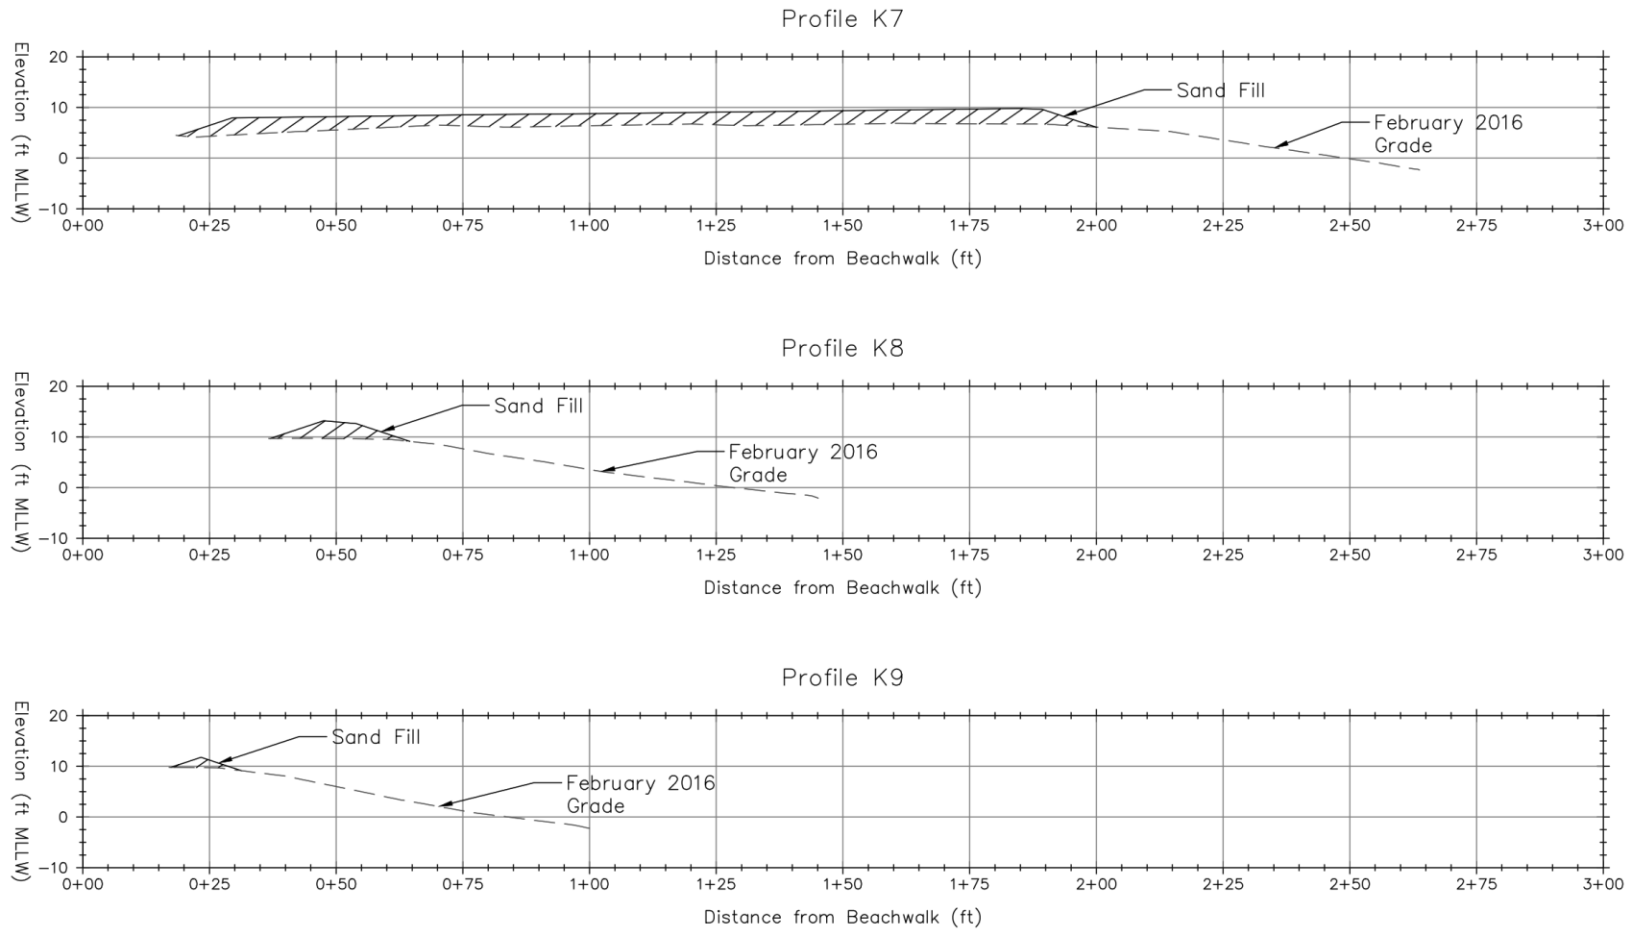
South Hanaka'ō'ō Point Berm Enhancement – Profile Views.
